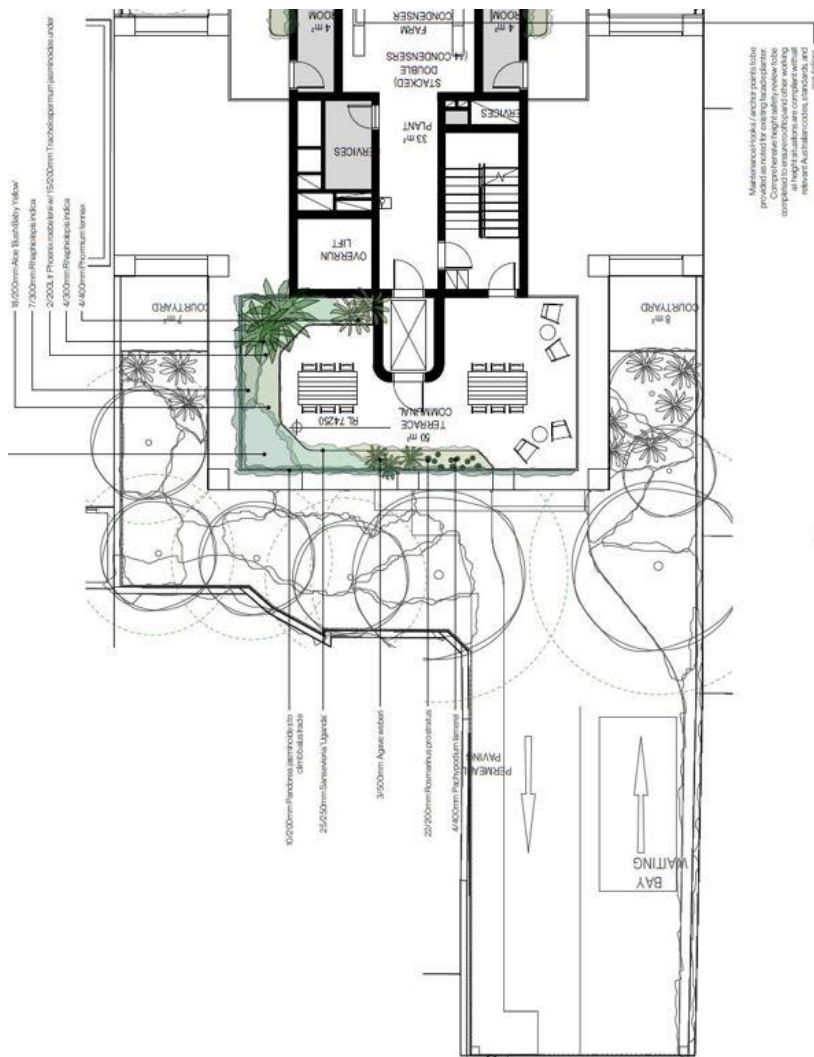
Ground floor level landscape plan drawing extract, showing the proposed location of tree plantings in the deep soil area at the rear of the site
